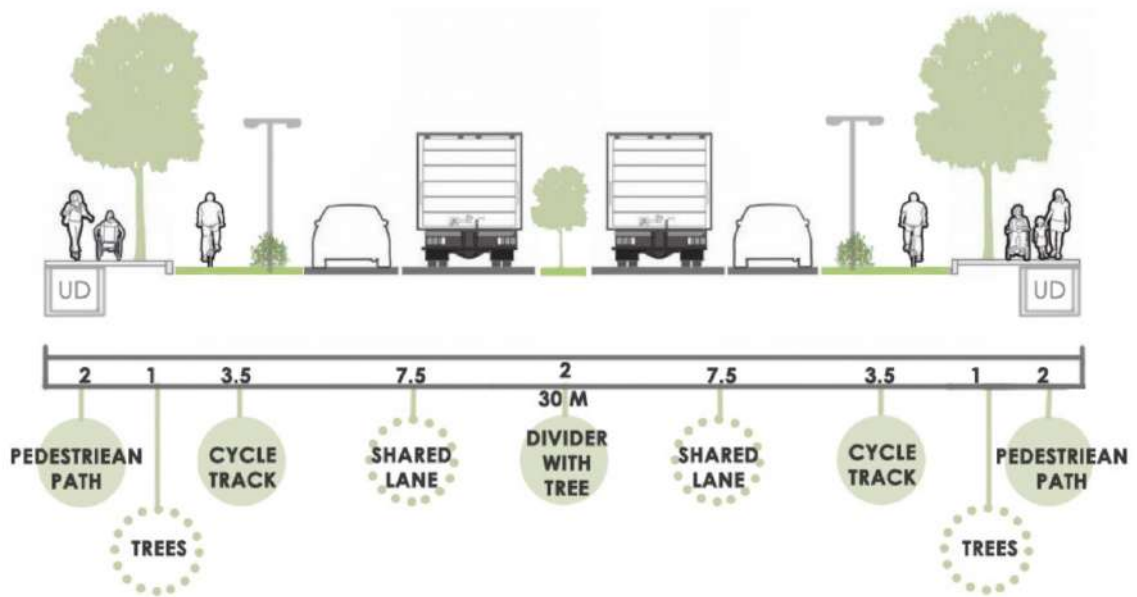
Typical layout of proposed 30m road (All Dimensions in meter)
